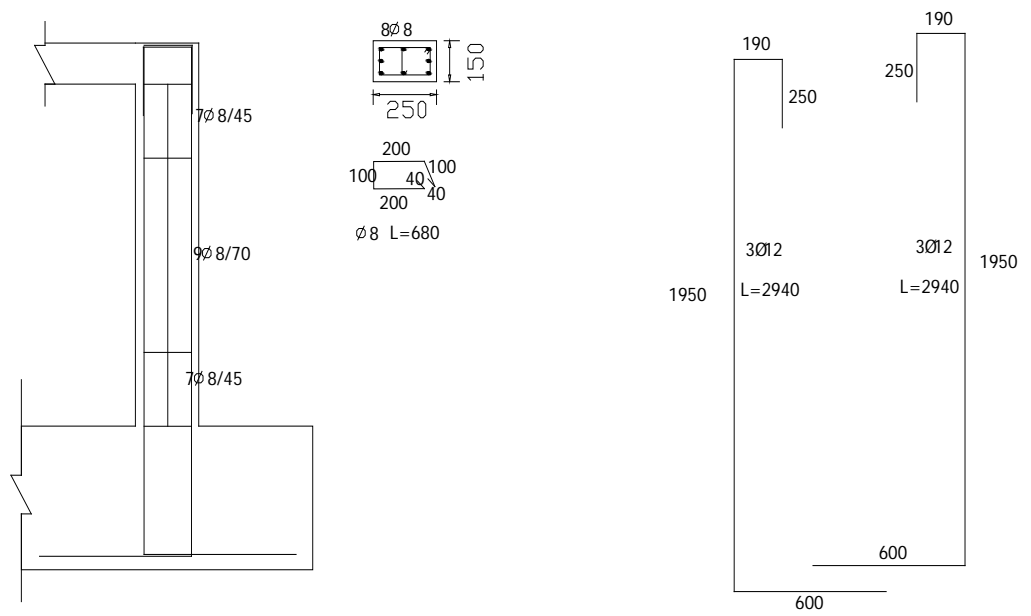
Detailing of column reinforcements (the units are mm.)
